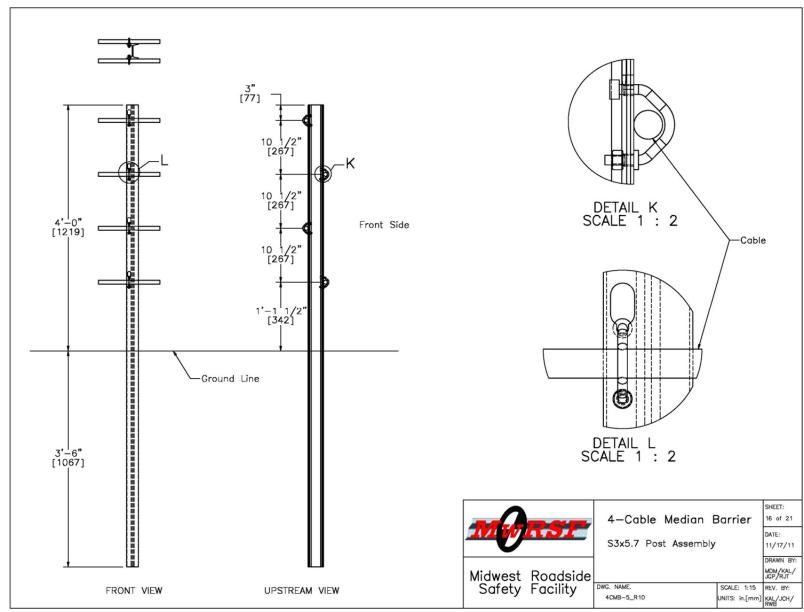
Post Assembly Layout, Test No. 4CMB-5
